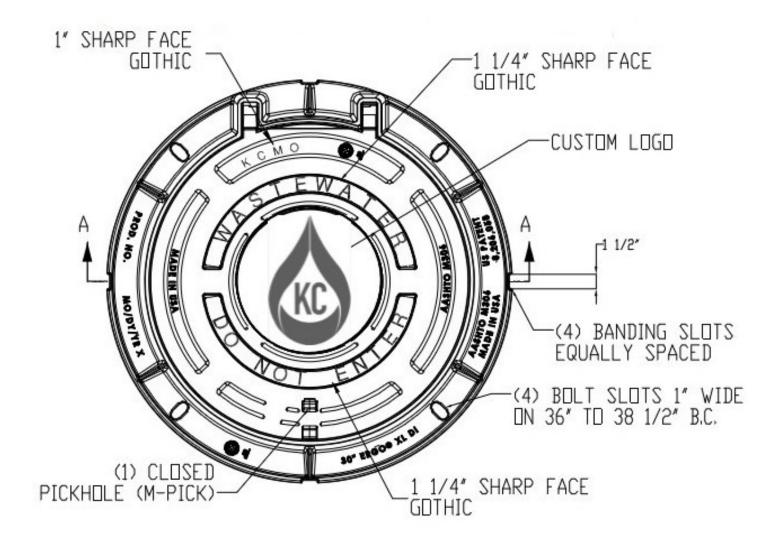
Standard Sanitary Sewer Manhole Markings For Ductile Iron Castings
